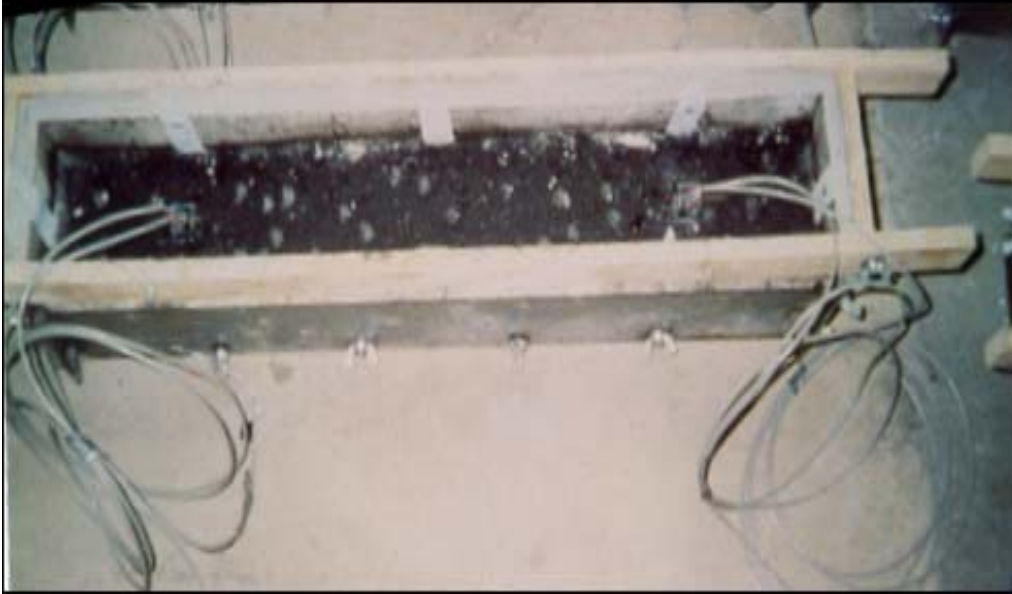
Installed Deflectometers Prior to PCC Placement
